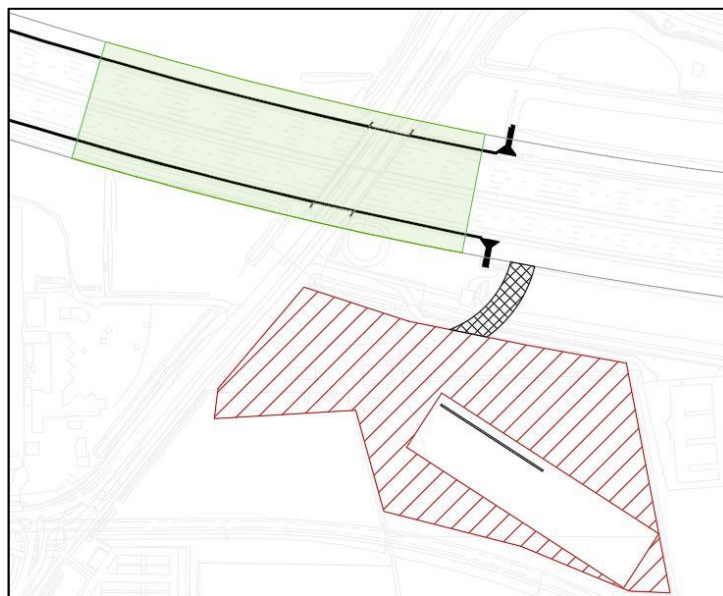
Schematic close-up of The Green Connection and construction site 1 for design two [2].
